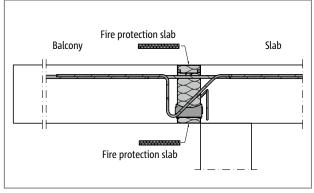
Schöck Isokorb® T type K-E, K-T for R0: retrofitting with fire protection boards
